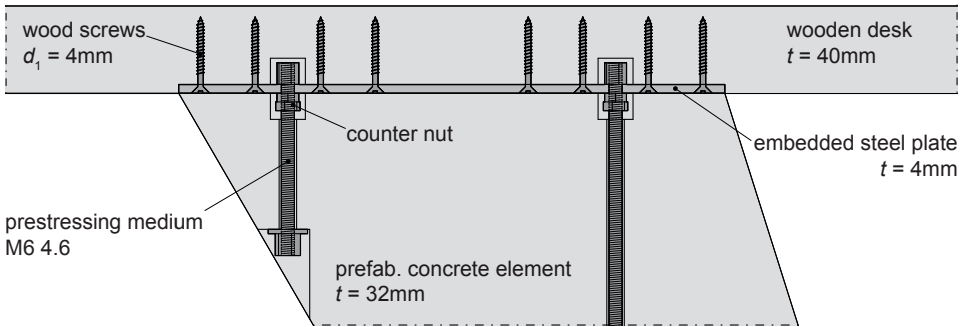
Concept of prestressing connection hidden inside the concrete and wood desk
